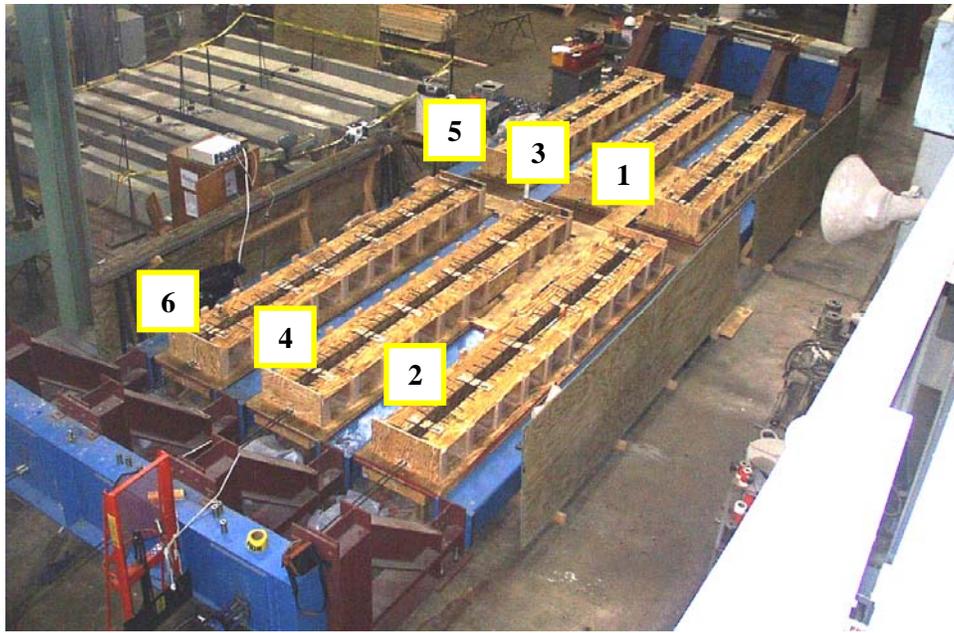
Prestressing Bed with Formwork Prior to Placement of Concrete
